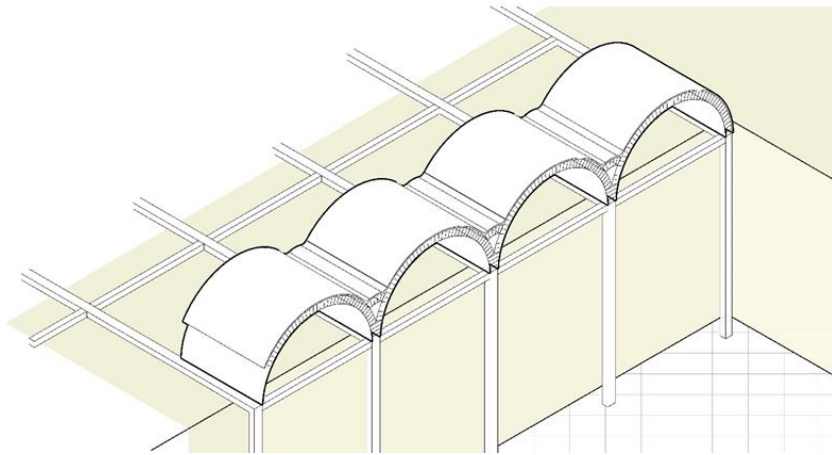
, interconnect the walls and roof very well and so rigid that no deformation occurs in the earthquake, drawing by author
